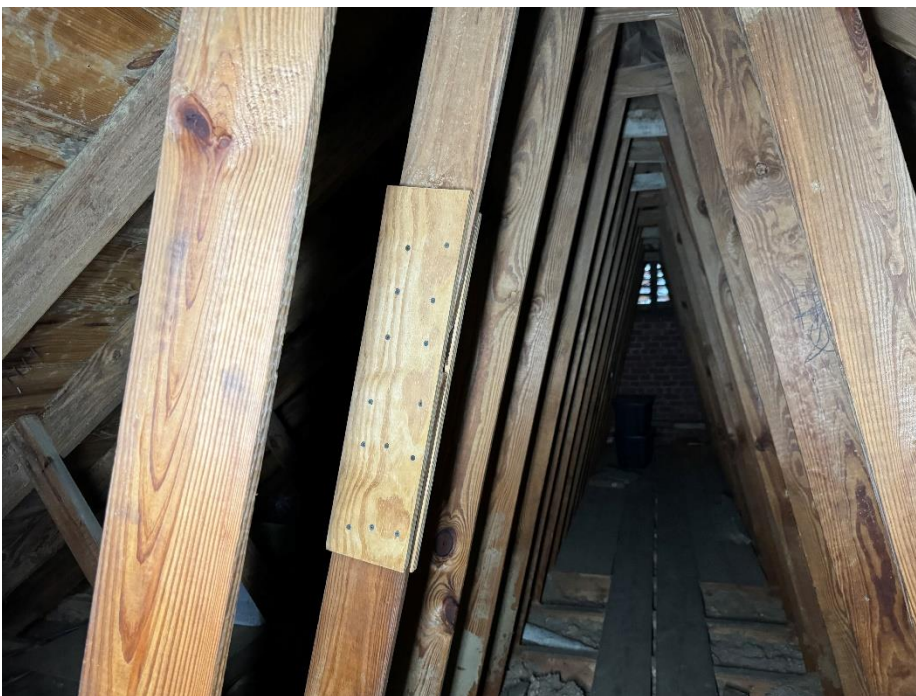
Bldg. 849 – Unit 3229: Step away of region where white staining was observed.
